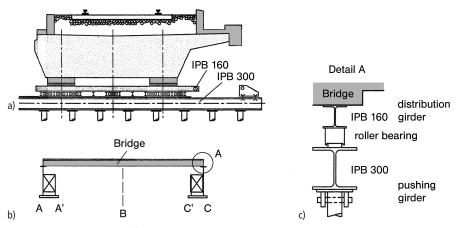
Partial collapse of a railway bridge between Solingen and Ohligs during sideways jacking. 1977, Case 11.29
